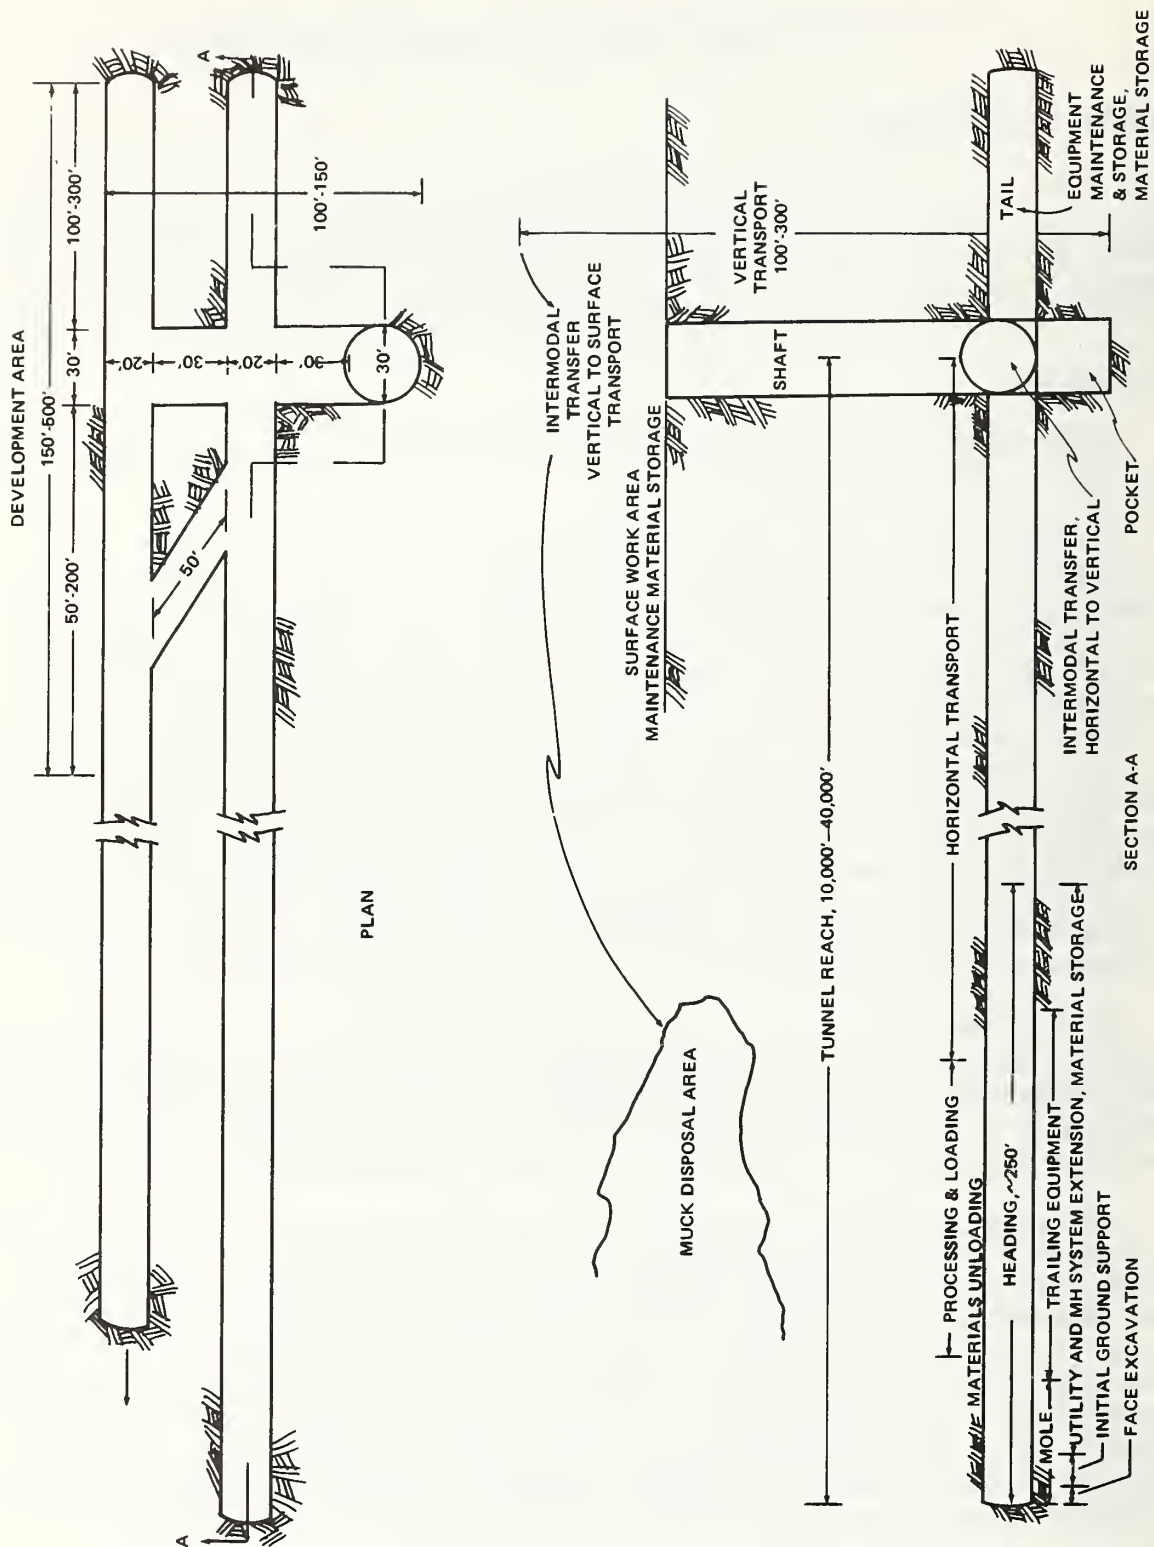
TYPICAL TUNNEL CONFIGURATION
